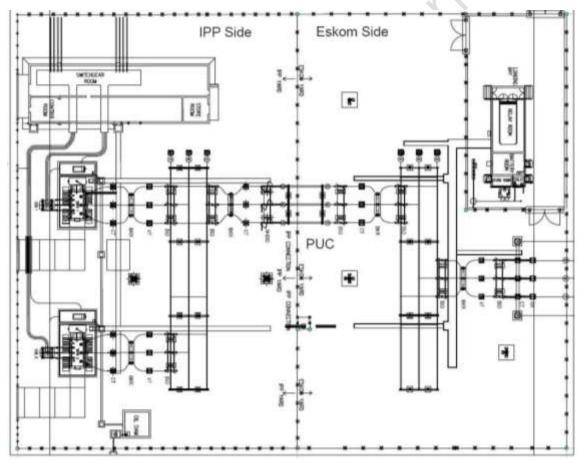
Typical Layout of an on-site substation (IPP Portion) (left) and adjoining grid substation/switching station (Operator Portion) (right) (Source: ENERTRAG South Africa (Pty) Ltd)
